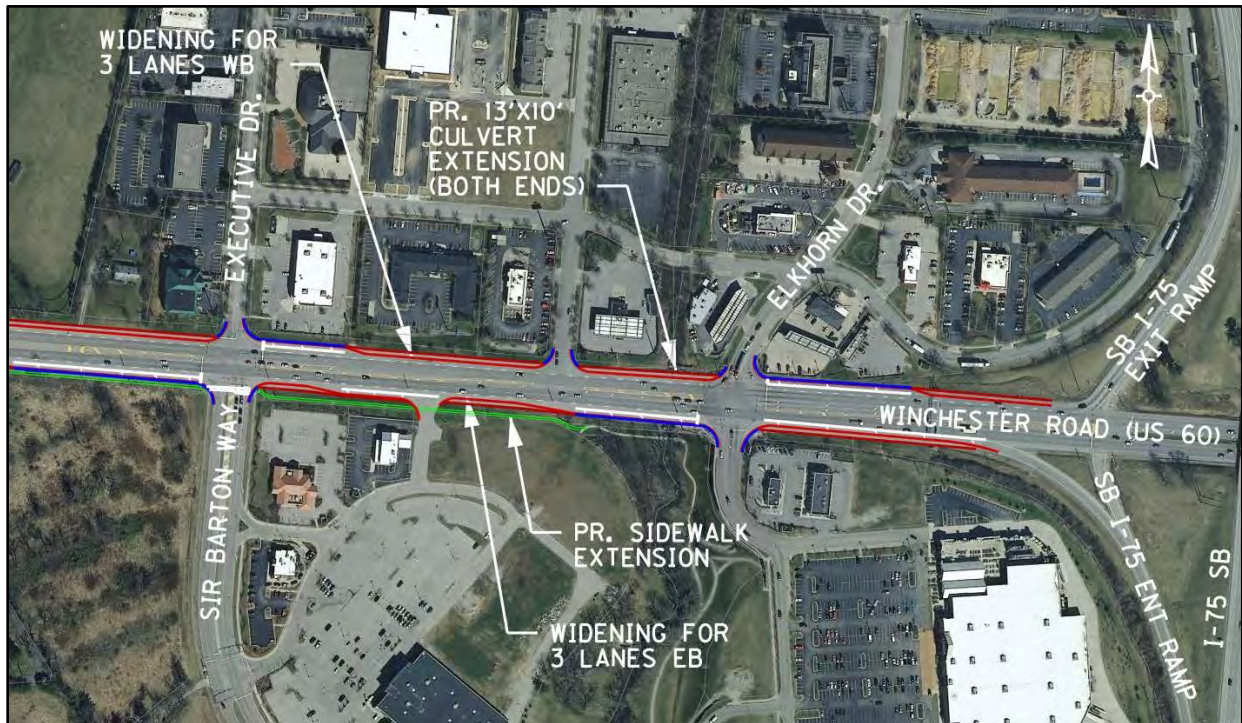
East Section US 60 Sidewalk Extension and Additional Lanes
